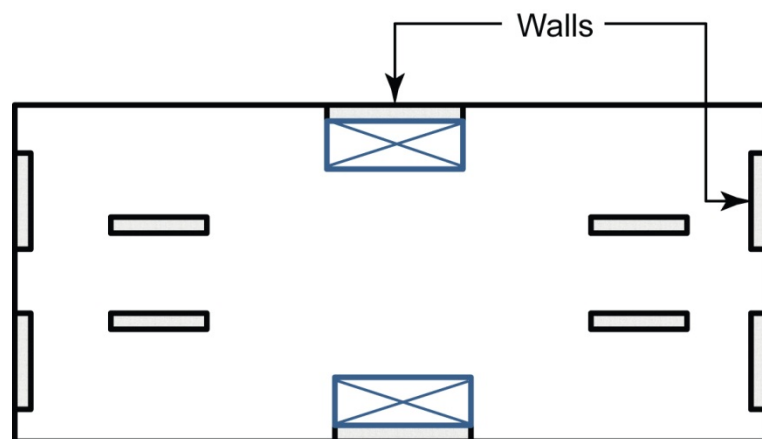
Alternative floor plan typically associated with mid-rise residential construction in the United States.
